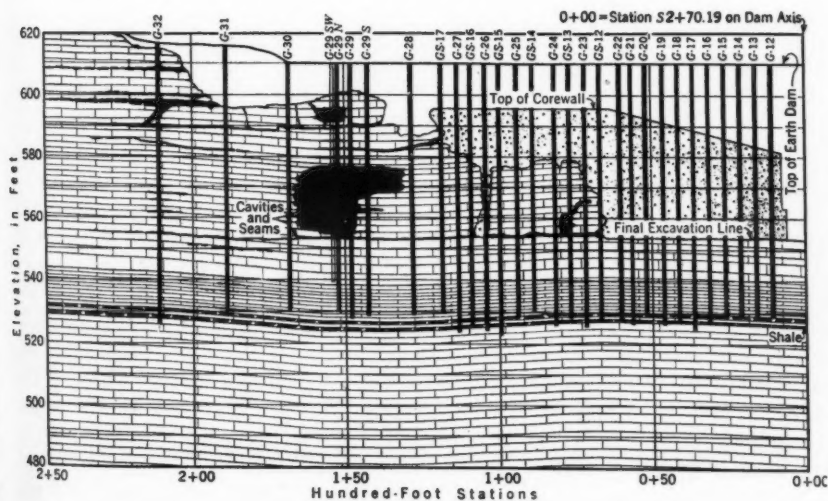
CAVITIES AND LOCATION OF DRILL HOLES; VIEW FACING UPSTREAM ALONG AXIS OF NORTH ABUTMENT, GUNTERSVILLE DAM
